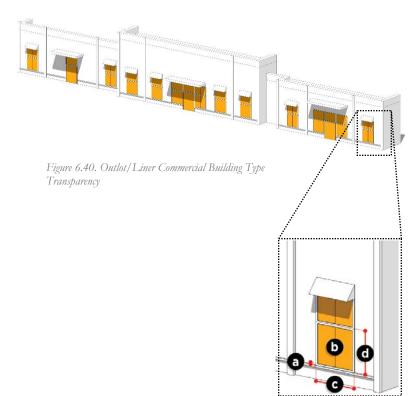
Outlot/Liner Commercial Building Type Window Dimensions
